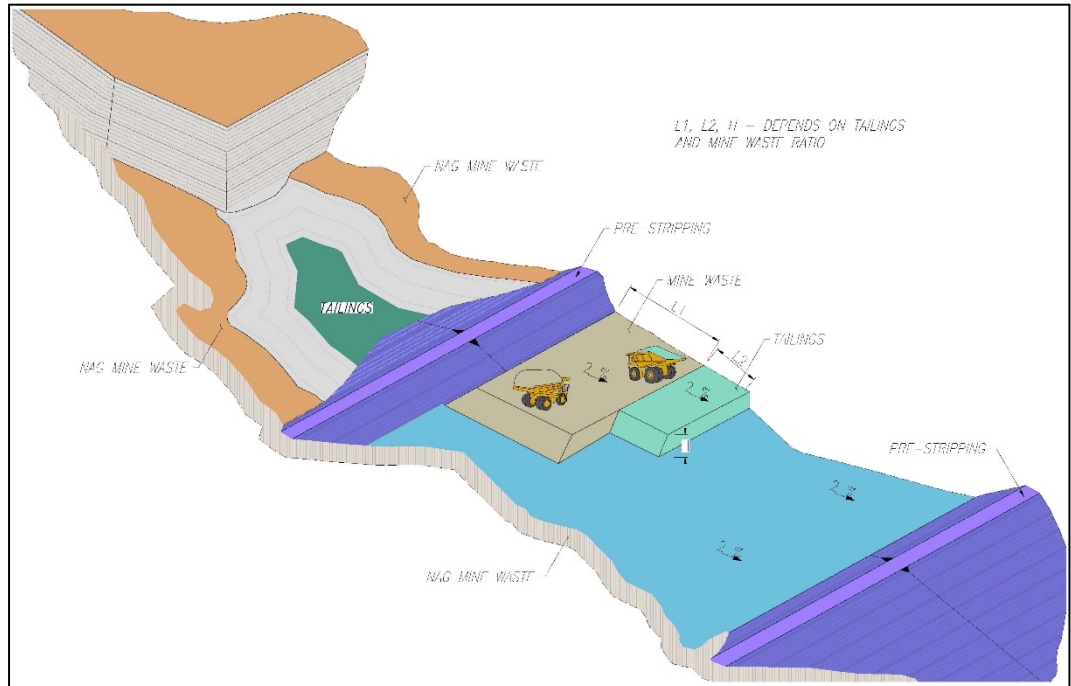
Mine waste-filtered tailings co-disposal in independent modules
